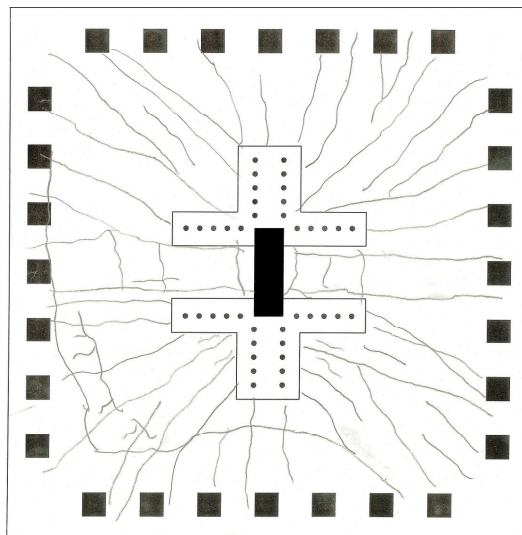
Failure surfaces and crack patterns of specimen OS25-b
